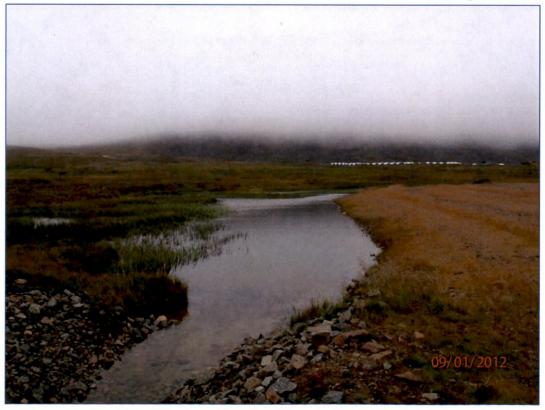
Site 9 Landfill – East side of landfill and adjacent pond, facing southwest.
